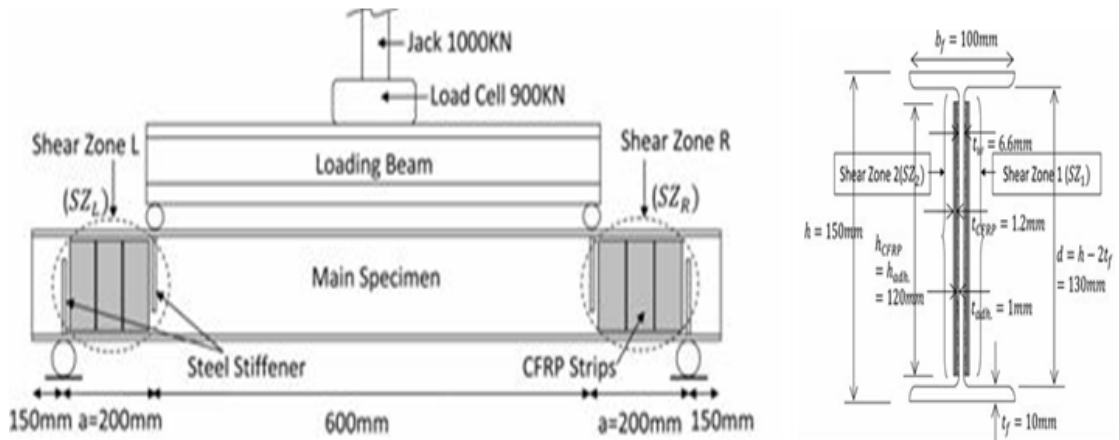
CFRP-strengthening and loading of specimen NB2 (Narmashiri et al, 2010)
